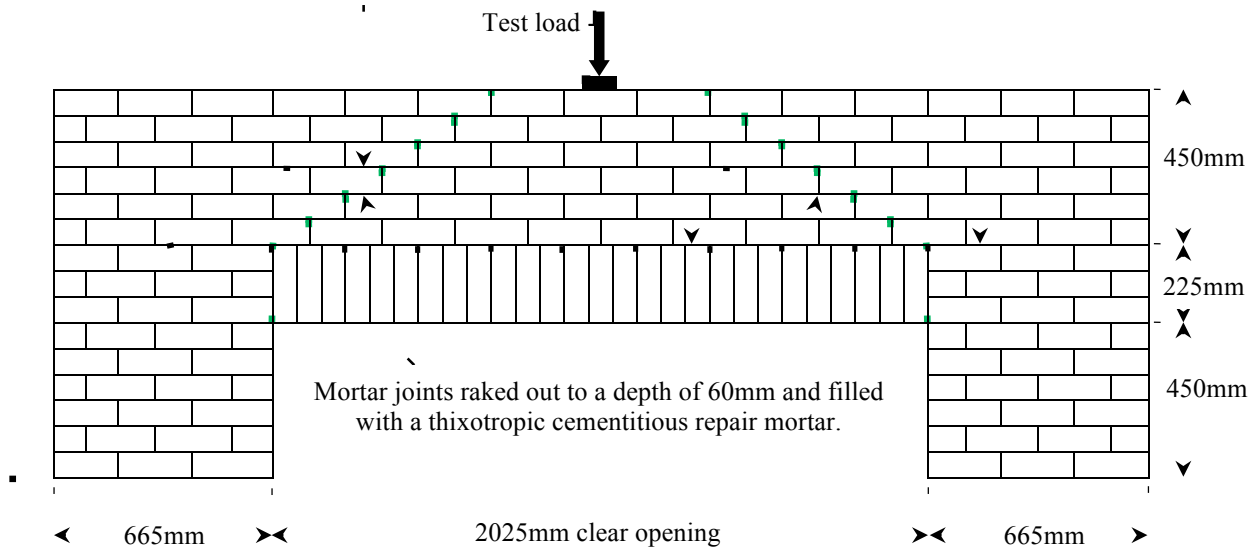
Typical Test Panel Details showing the Test Load Position, Reinforcement Layout and Simulated Diagonal Cracking Damage
